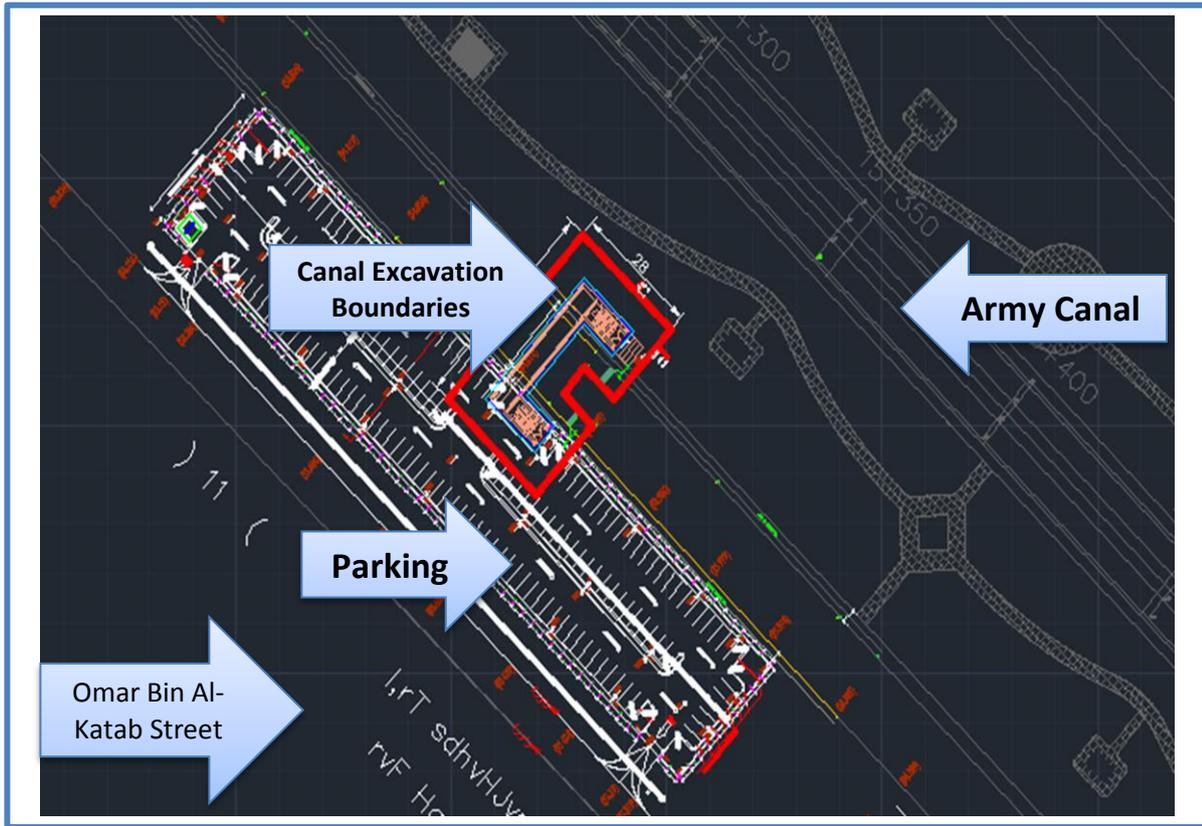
The project of Zayona tunnel at army canal and surrounding activities .
